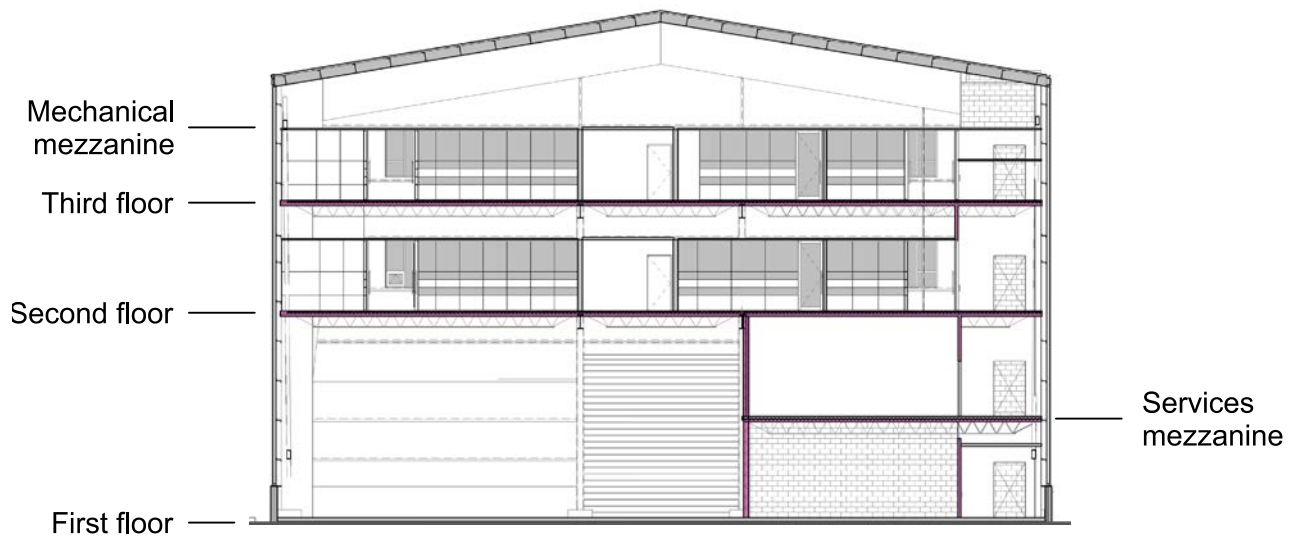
MULTI-PURPOSE MACHINE SHOP BUILDING FLOOR ARRANGEMENT
